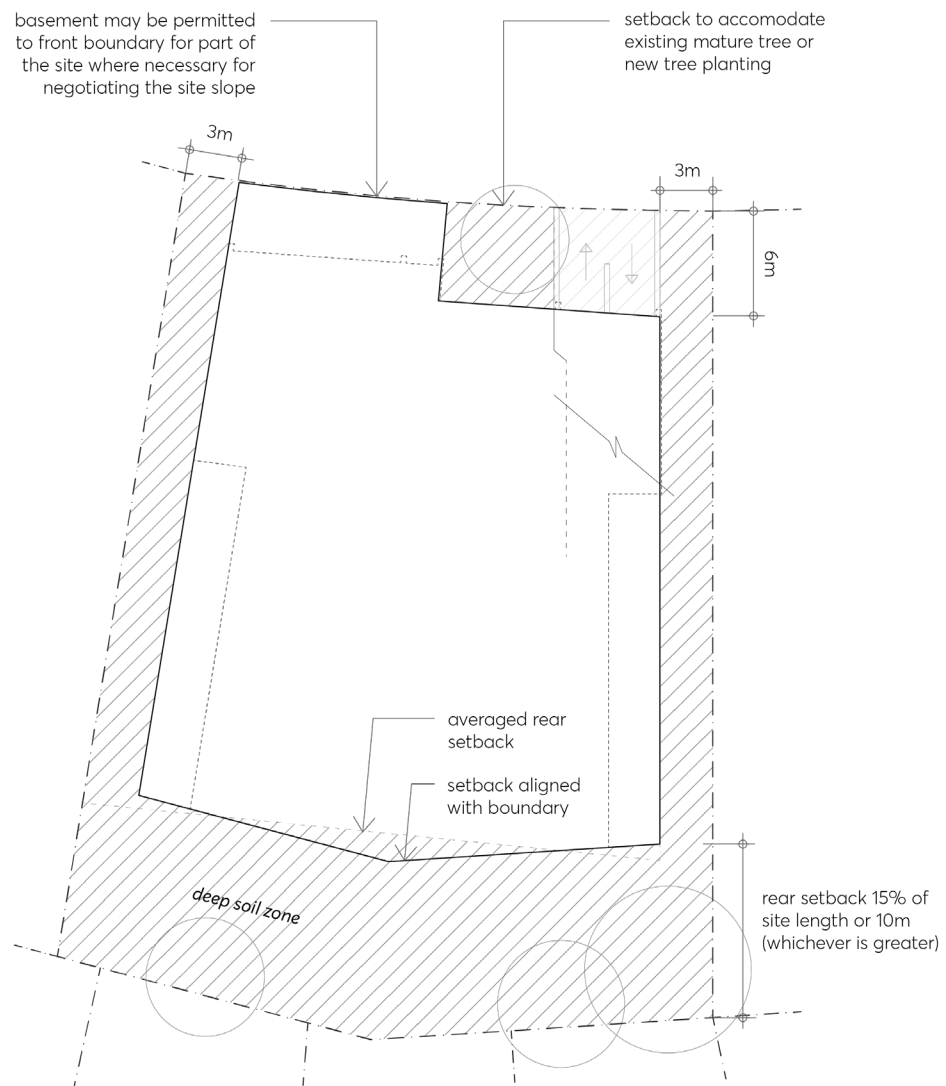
Indicative Basement and Deep Soil Plan
